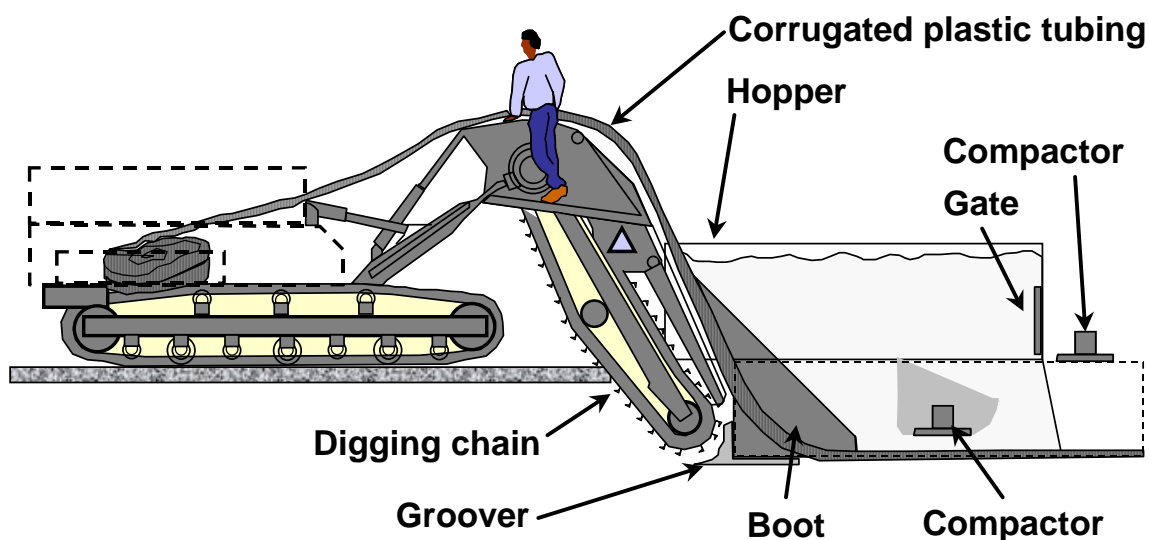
Automated equipment for installing pipe edge drains (NHI 1999).
